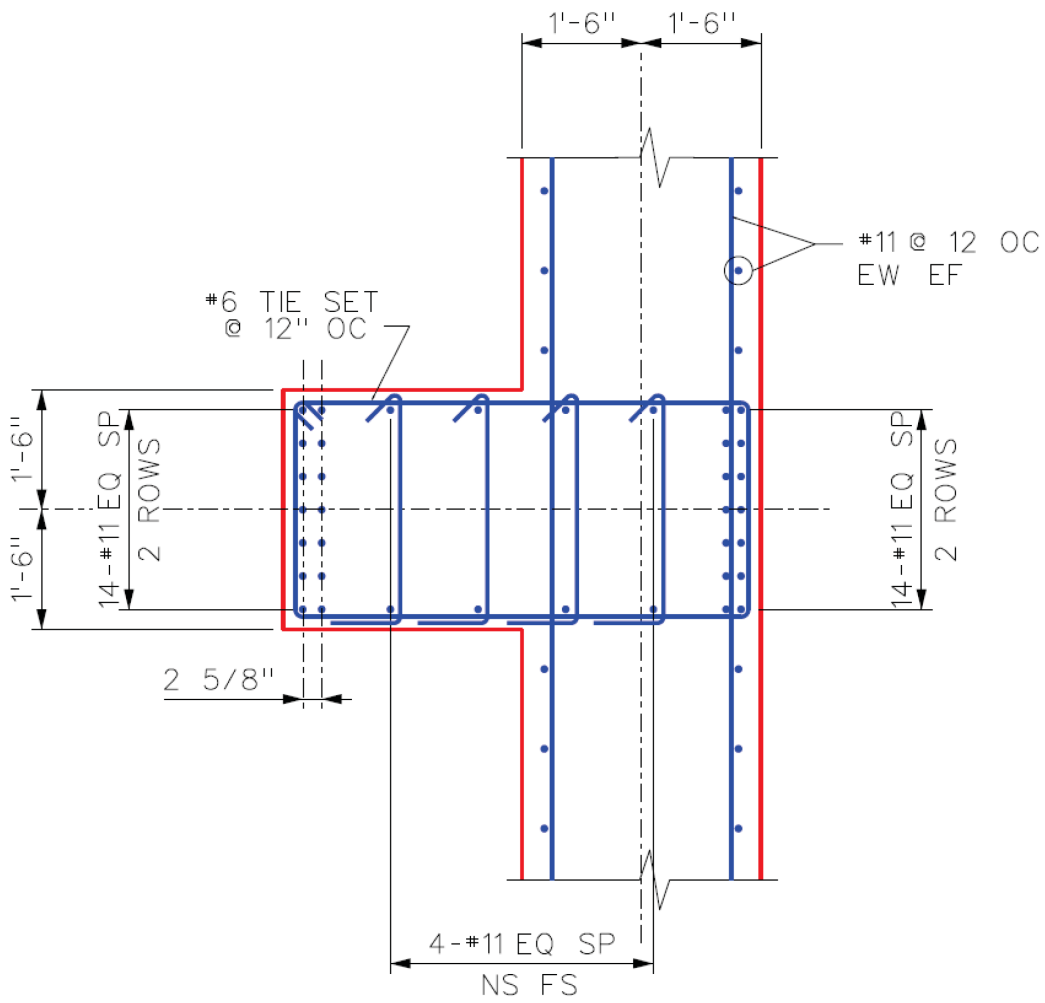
B-82: CRB Reinforcement Detail for Pilaster Type 2
